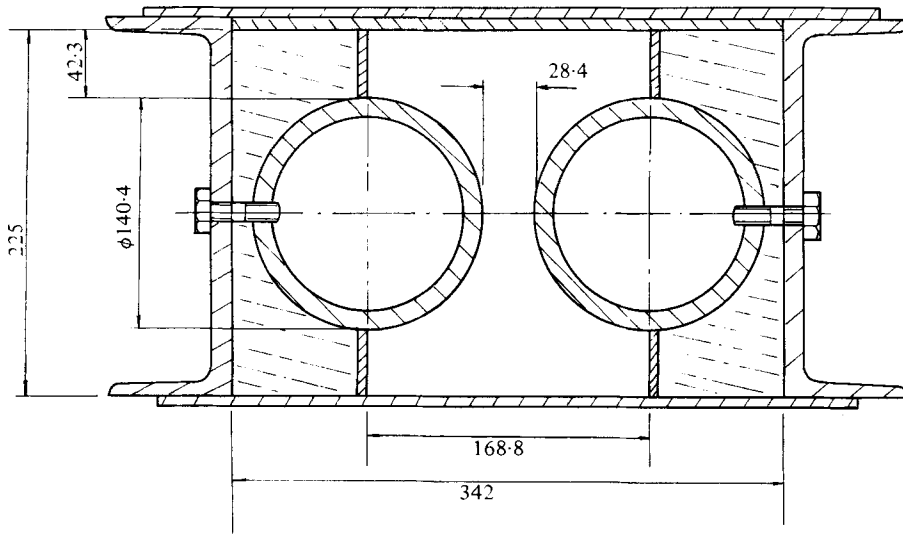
Cross-section of tunnel (dimensions in mm).
